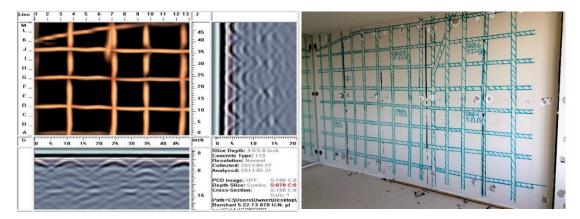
GPR test on existing concrete wall. GPR readings (left) and marked layout of the reinforcement in the concrete (right). UN Plaza building, New York (2013)
